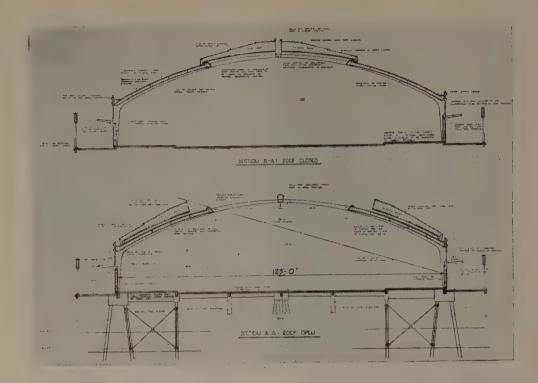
Cross Section of Reconstruction With Roof Closed (Top) and Open (Bottom)
